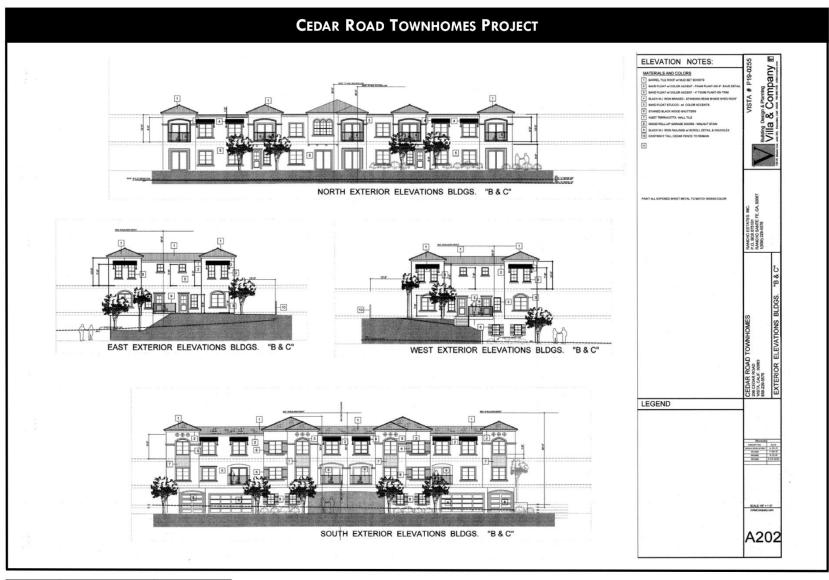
EXAMPLE OF PROPOSED BUILDING ELEVATIONS
